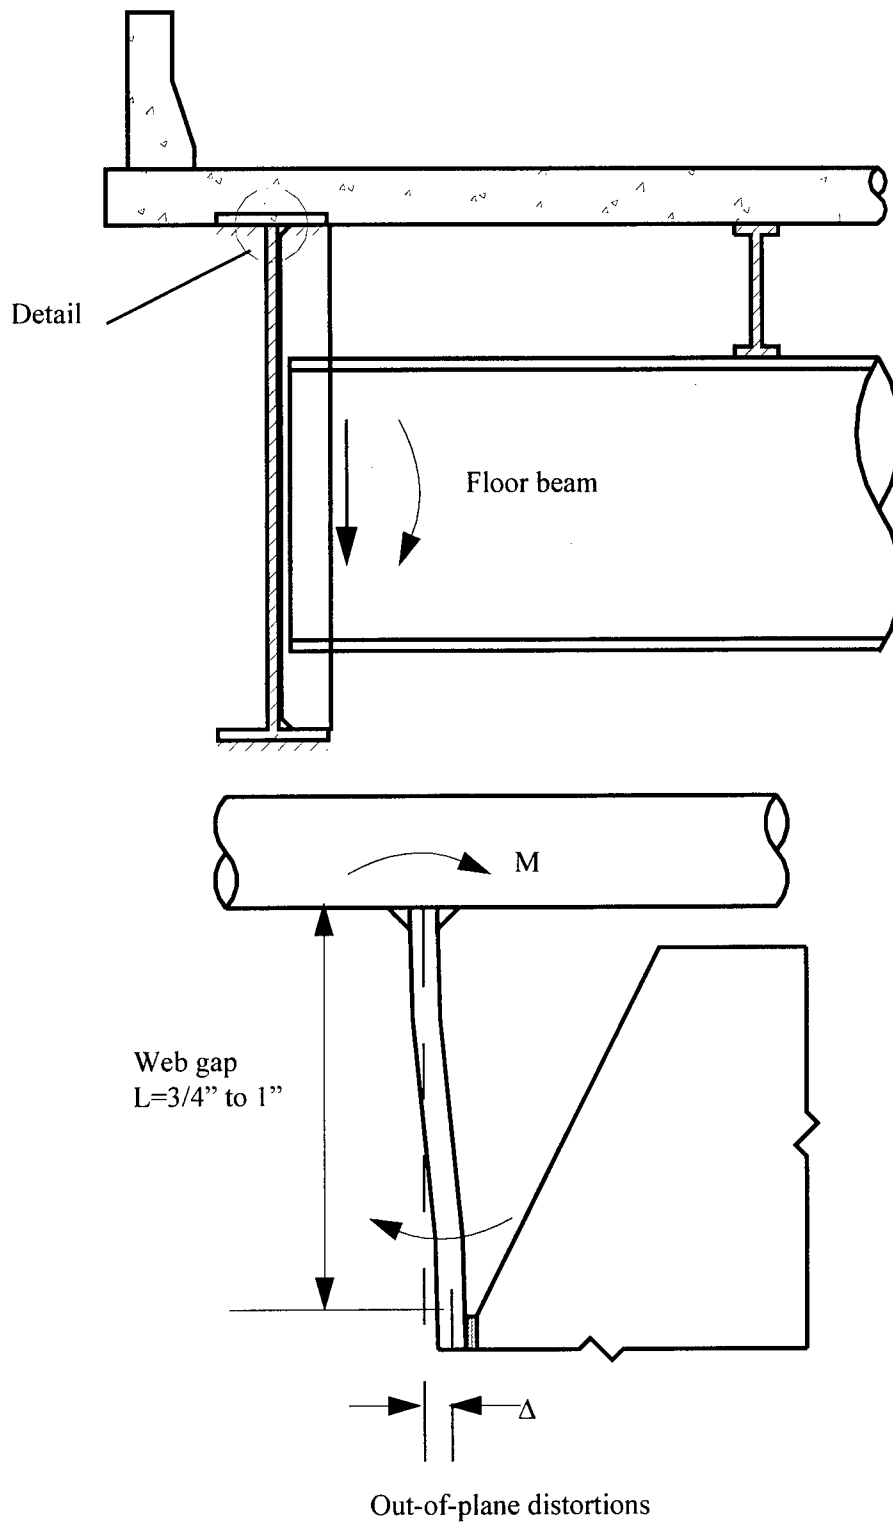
A typical source of fatigue cracking in a steel bridge
